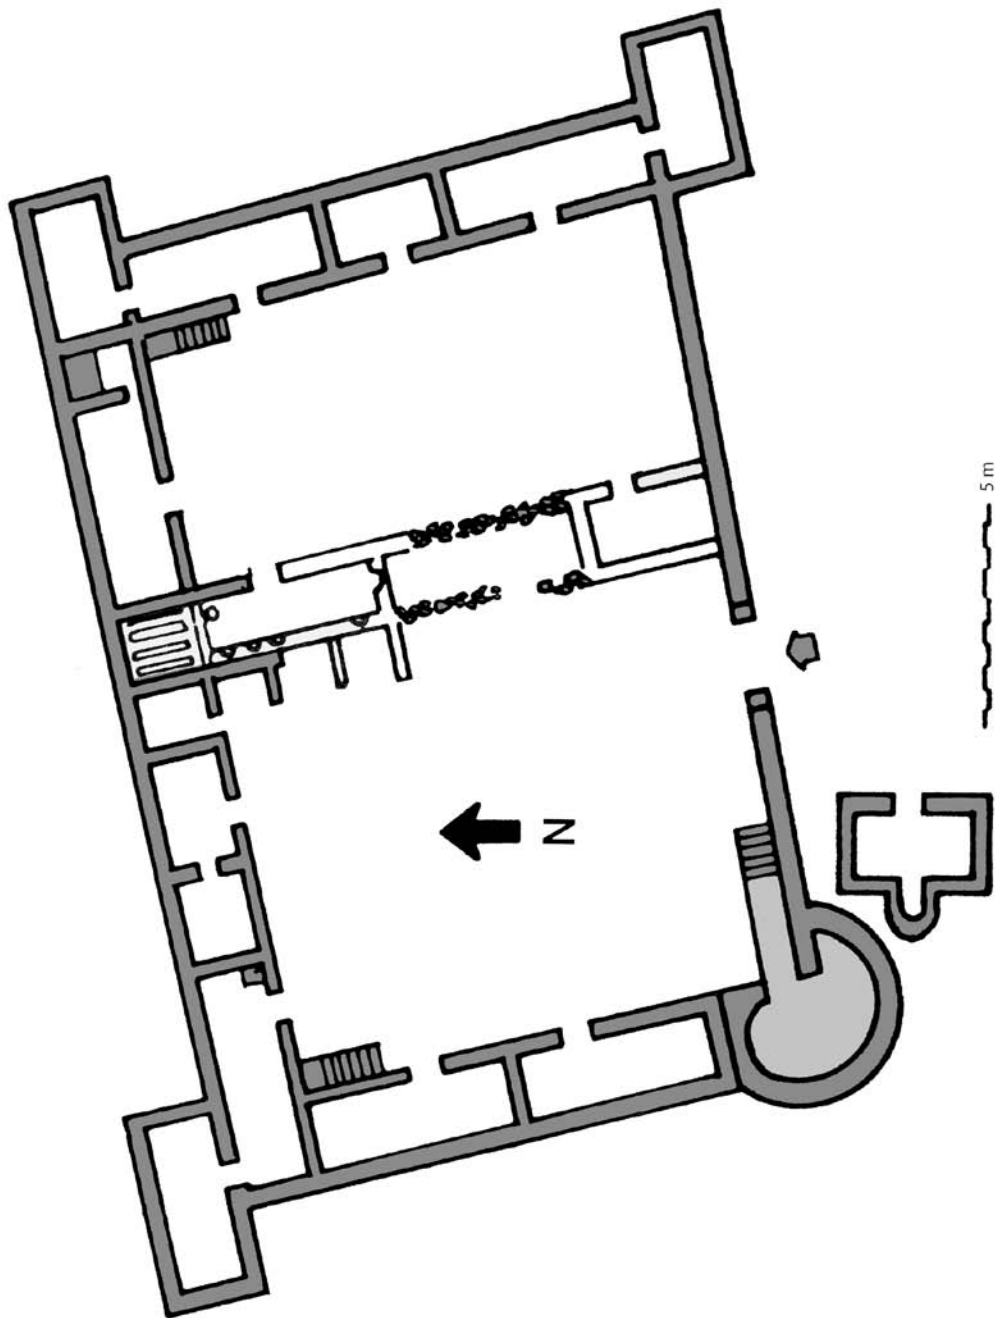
Qal'at Rakayyat: ground plan.
